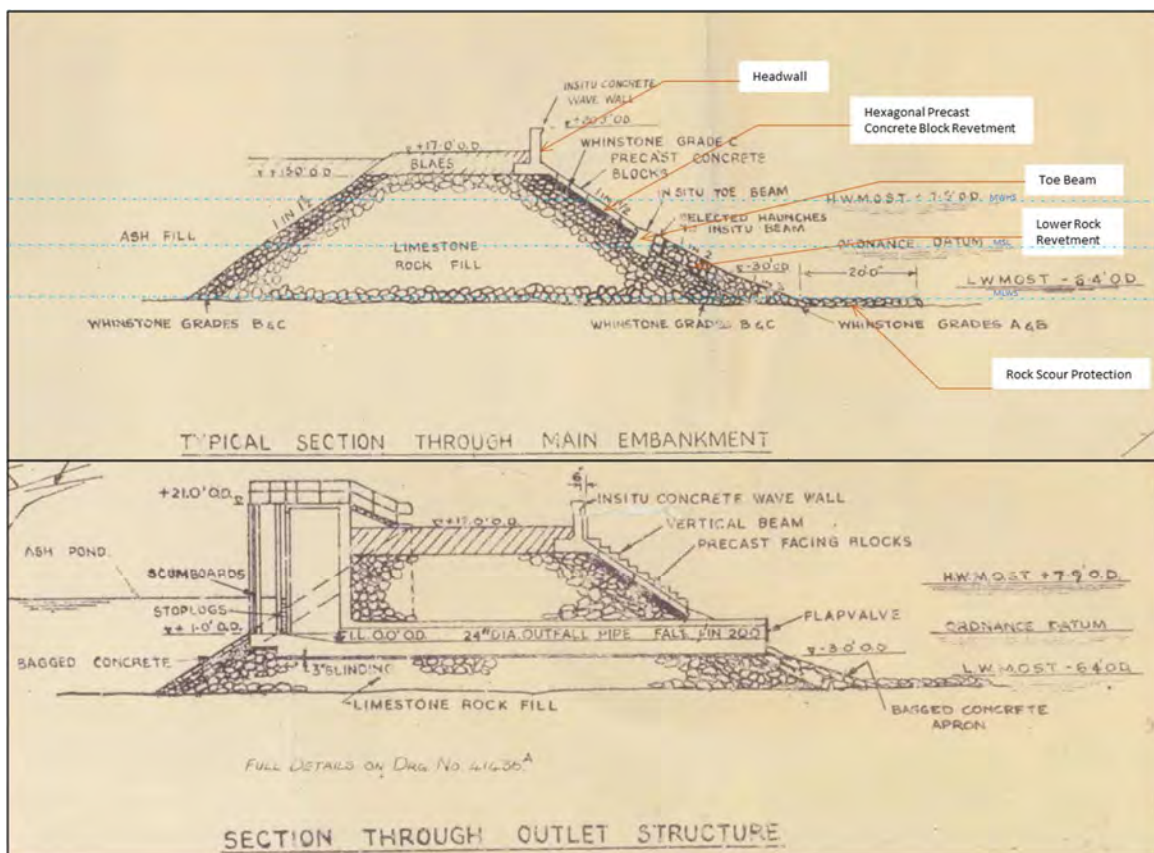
Seaward facing revetment sections [Extract taken from Drawing Number 35672c General Layout & Typical Cross Sections of Embankments, (James Williamson and Partners, 1963)]
